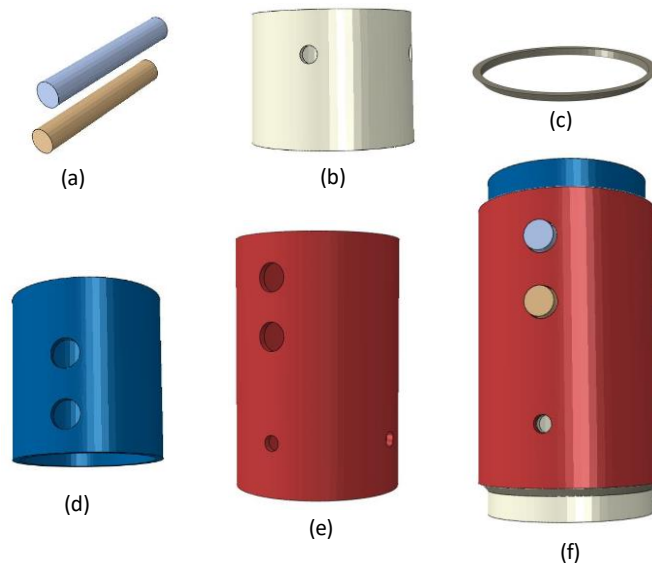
(a) Steel pins, (b) extension pile, (c) weld, (d) lead pile, (e) external coupler, (f) complete assembly.
